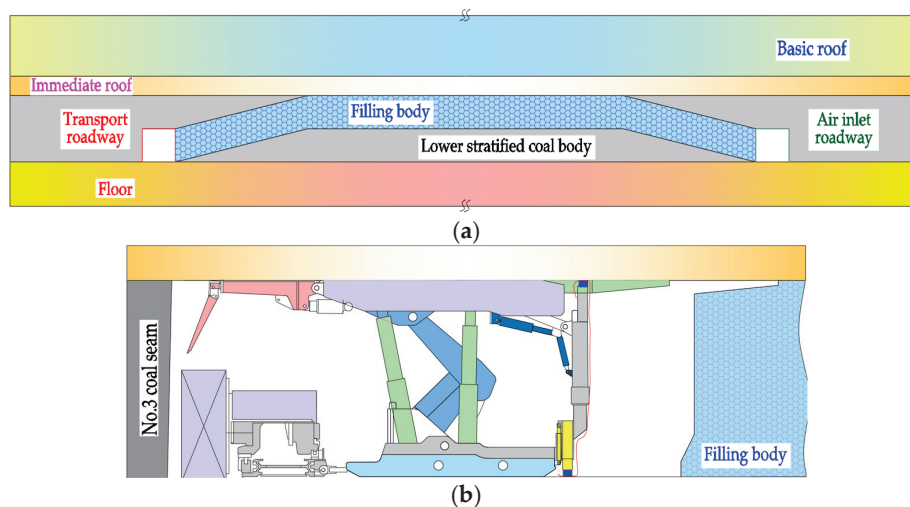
Filling workingface layout and recovery process. (a) Layout of the filling working face, (b) Backfilling process.
